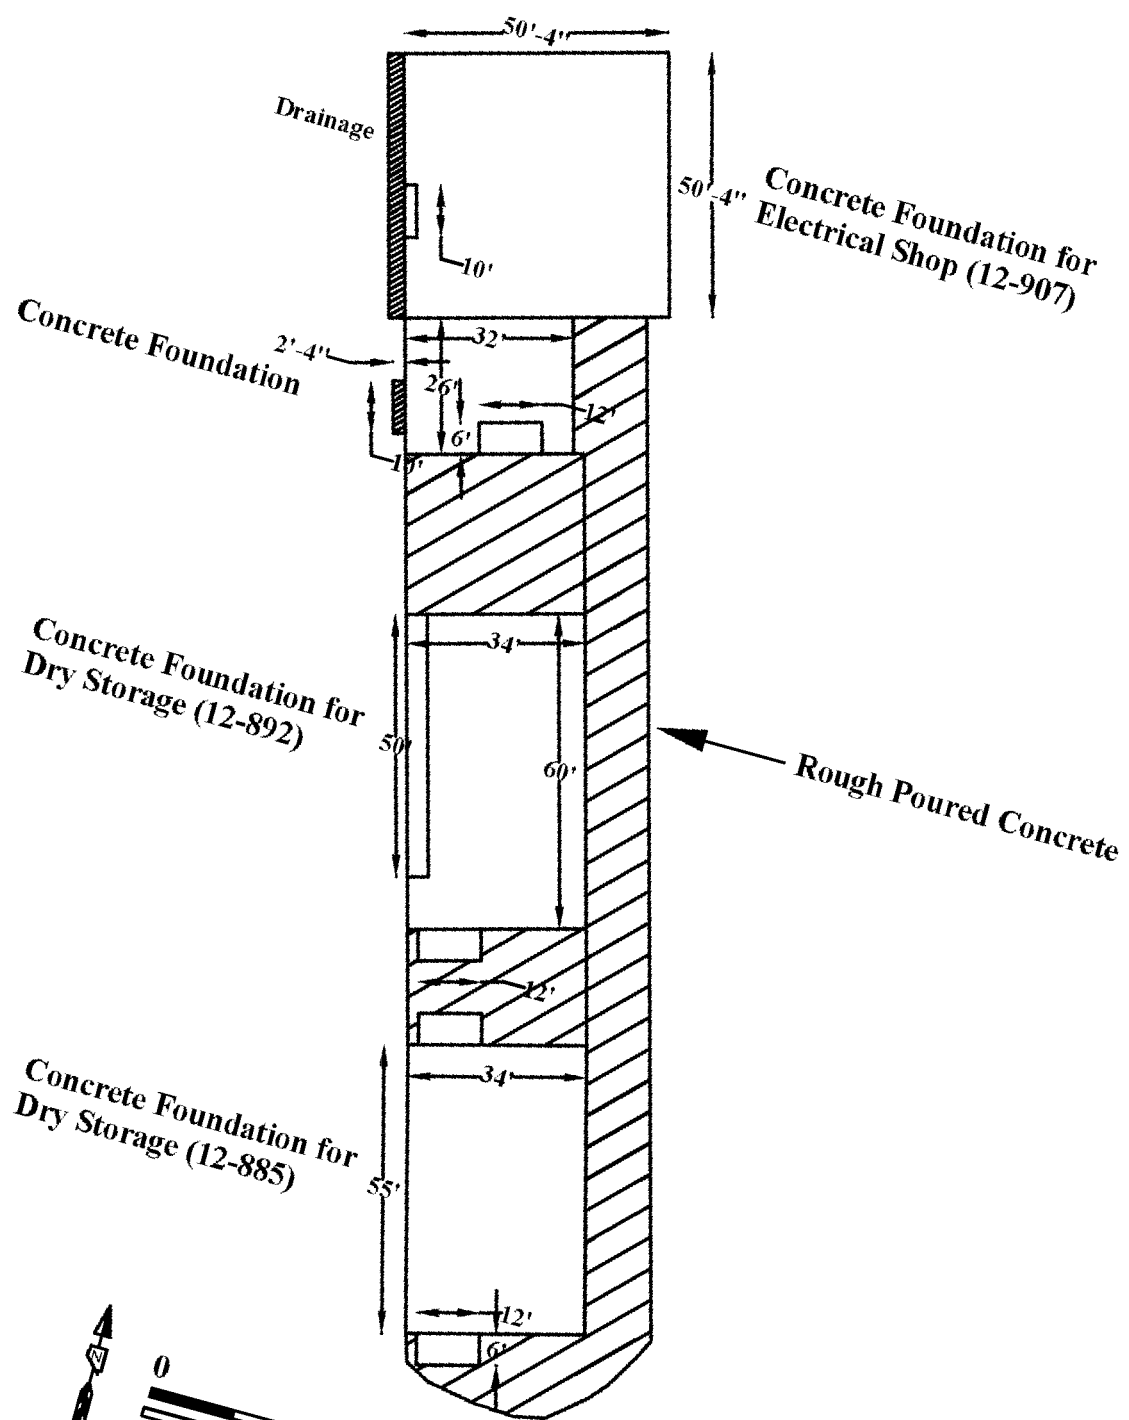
Plan map of Feature 41, concrete foundations (electrical shop and dry storage), U12n Tunnel.
